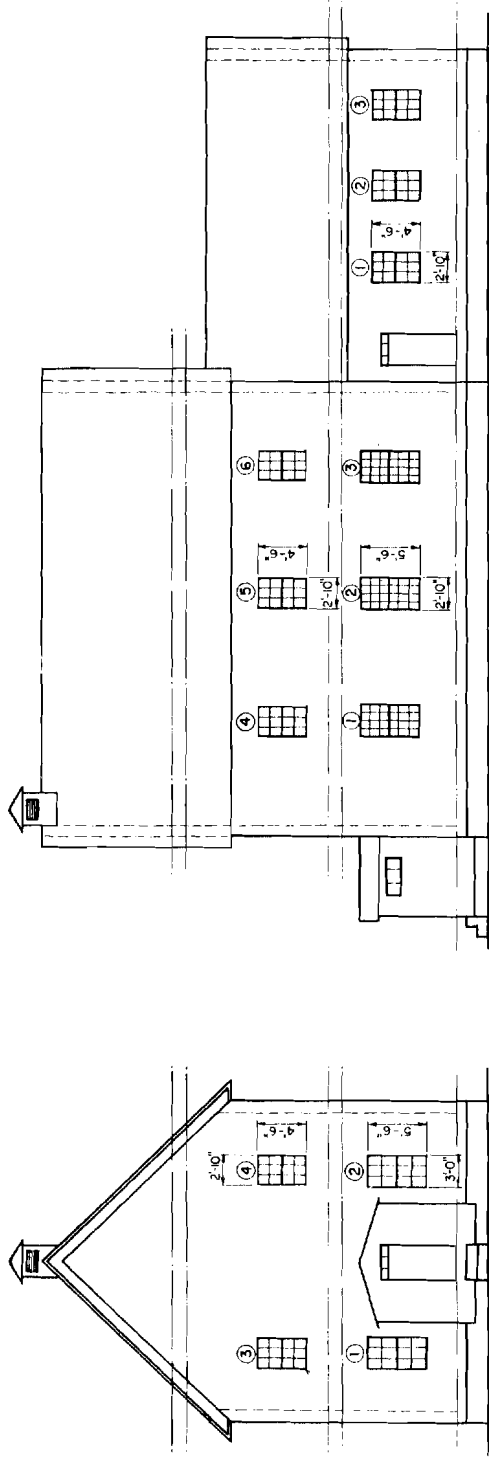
ELEVATIONS OF BUILDING No. 8 (SCHOOL)
